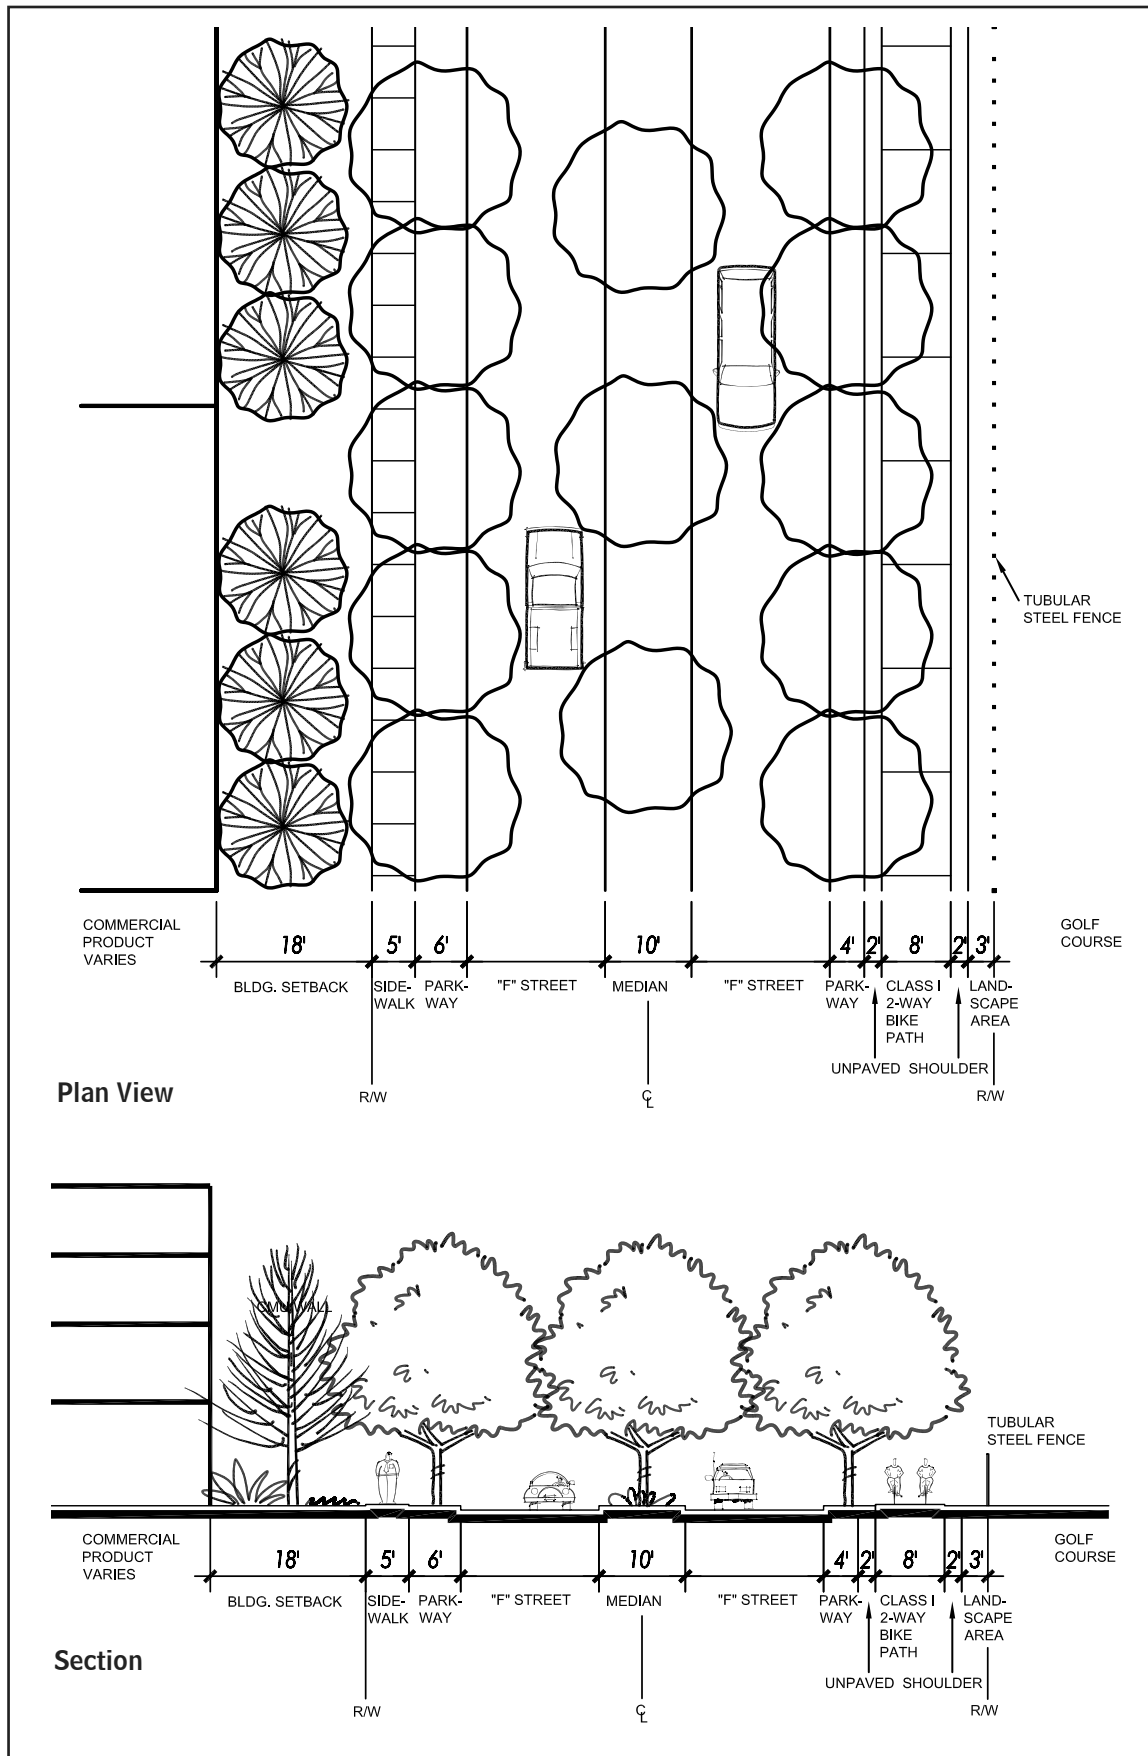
Bike path at "F" Street, west of Park "D", east of "G" Street .
